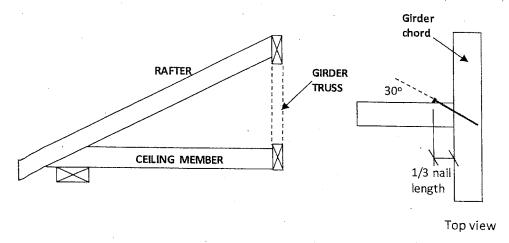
Toe-Nailing Rafter / Ceiling Member to Girder Truss
